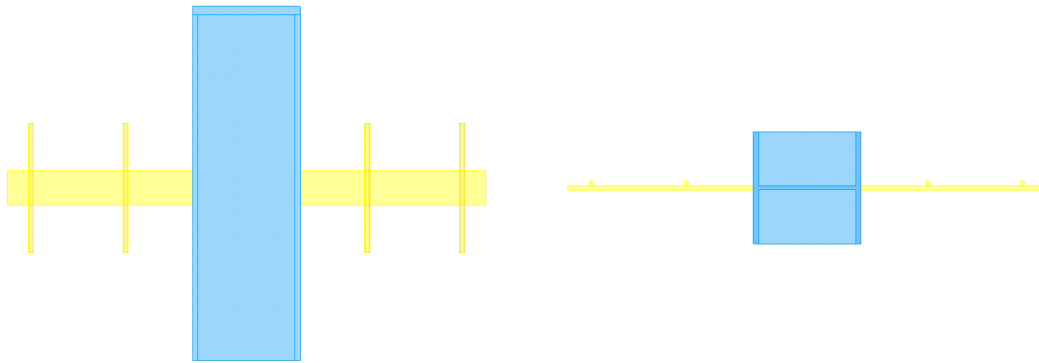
Steel components of the test specimen; steel plate, HEA260 and KBA-5. The component KBA-5 was welded to the HEA260, while the steel plate was placed on top of the HEA260.
